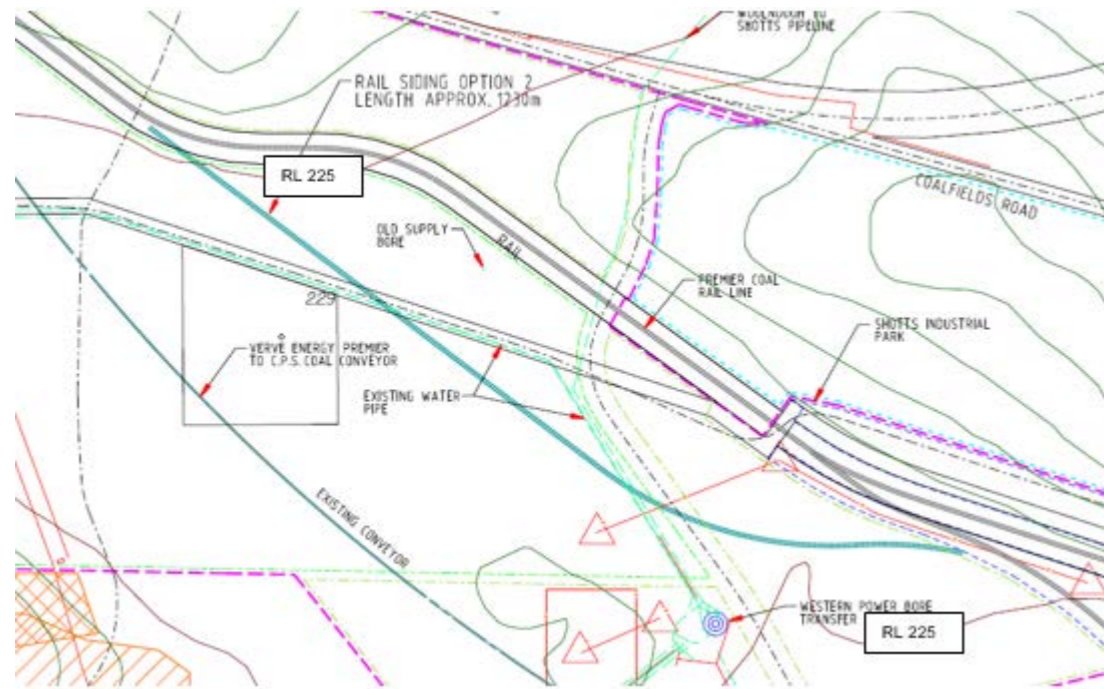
Rail Siding Option 2 Wood & Grieve (2008)
